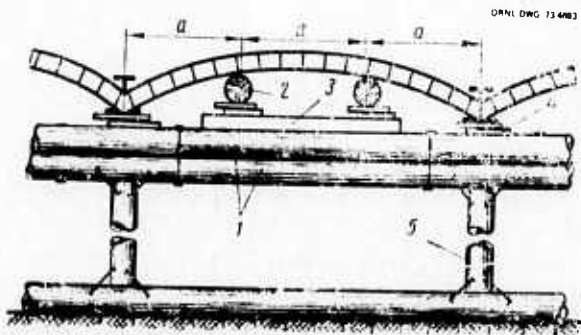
Reinforcing a brick arched ceiling: (1) double girder; (2) beam; (3) lining; (4) shims; (5) support [column].
